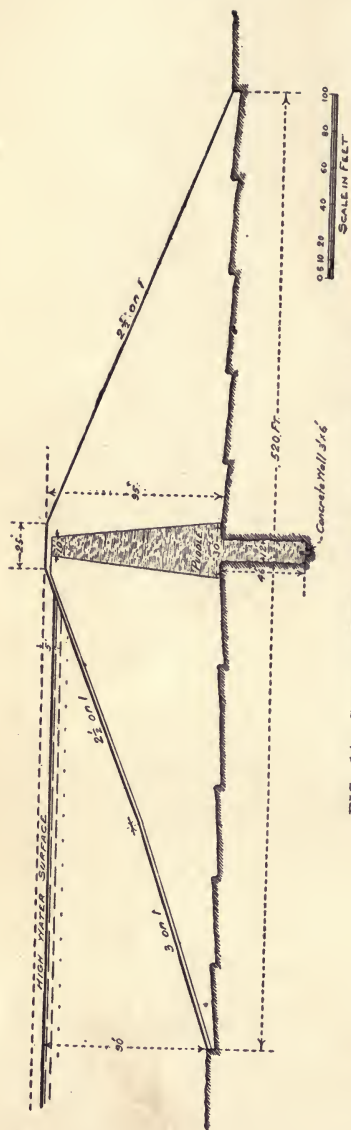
CROSS-SECTION OF PILARCITOS DAM.
